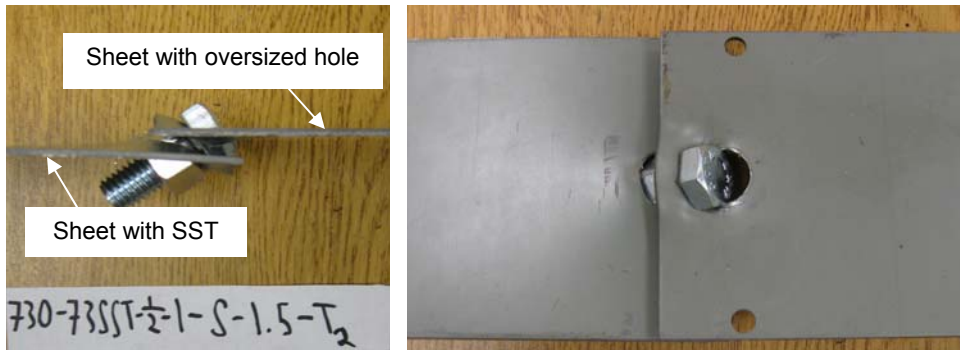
Shear Failure of Test Specimen 730-73SST-1/2-1-S-1.5-T2
